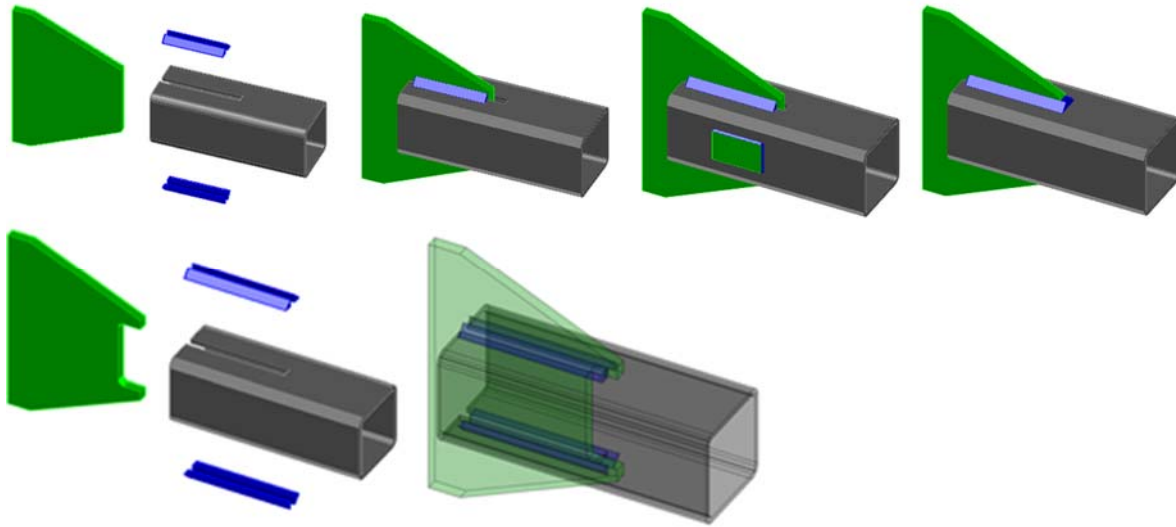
Left: Conventional HSS brace-to-plate connections: a) assembly of parts, b) unreinforced, c) with side-reinforcement plates, and d) with wrapped-around welds. Right: Slotted-Hidden-Gap (SHG) connection: e) assembly of parts and f) X-ray view.
